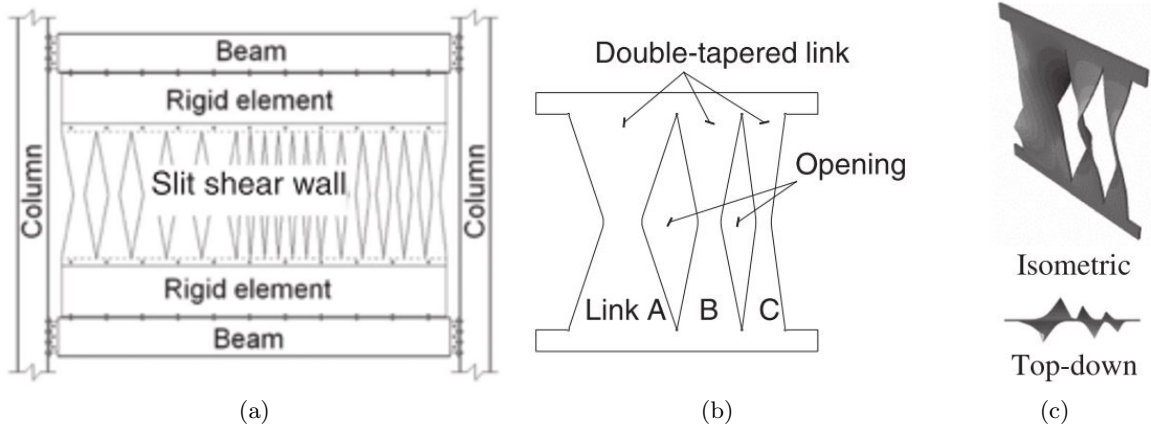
(a) elevation of the slit shear wall, (b) arrangement of the openings in the slit wall and (c) isometric elevation of the openings (Kurata et al., 2015)
